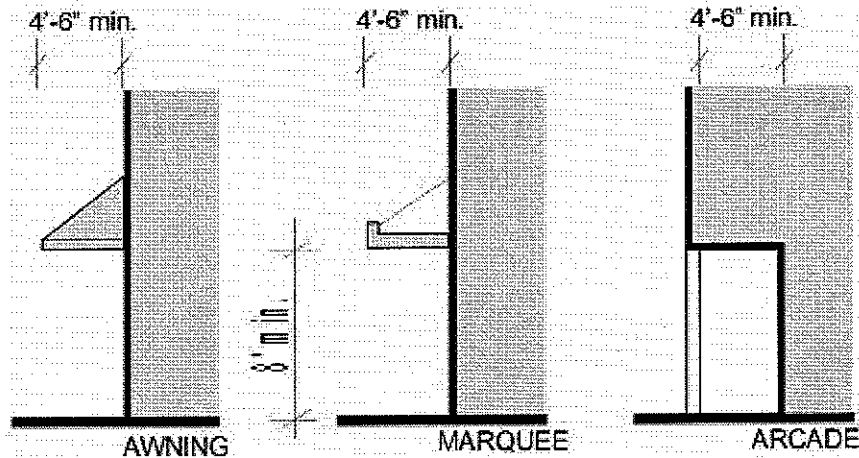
(C)(2): Examples of awning, marquee, and arcade.
